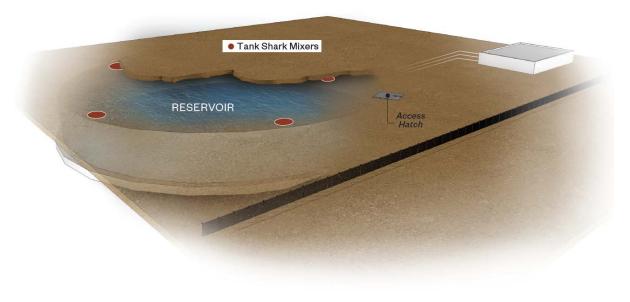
Reservoir 2 Proposed Tank Shark Mixing System Layout
